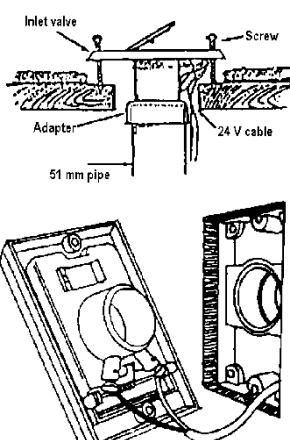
Floor installation of inlet valve. Fig. 7.10. Extension to be glued to the inlet valve when walls are too thick. (Additional equipment) If installing the backing plate is a problem,a floor adapter can be used.
